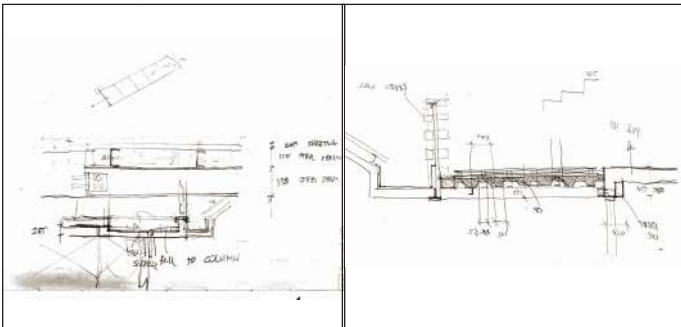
Gym decking and composite flooring detailing (Author: 2019)
